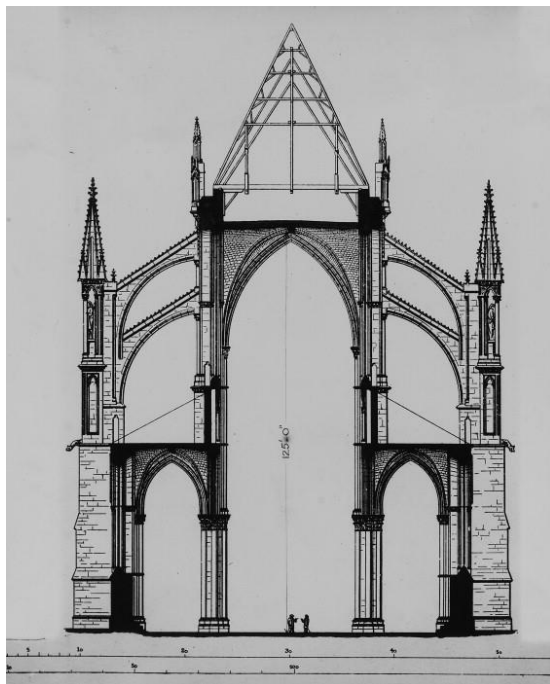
Nave section, Cathedral of Notre-Dame de Reims, Reims, France (1211-1417). Timber roof truss configuration ("Cathedral of Notre-Dame" 2014).
